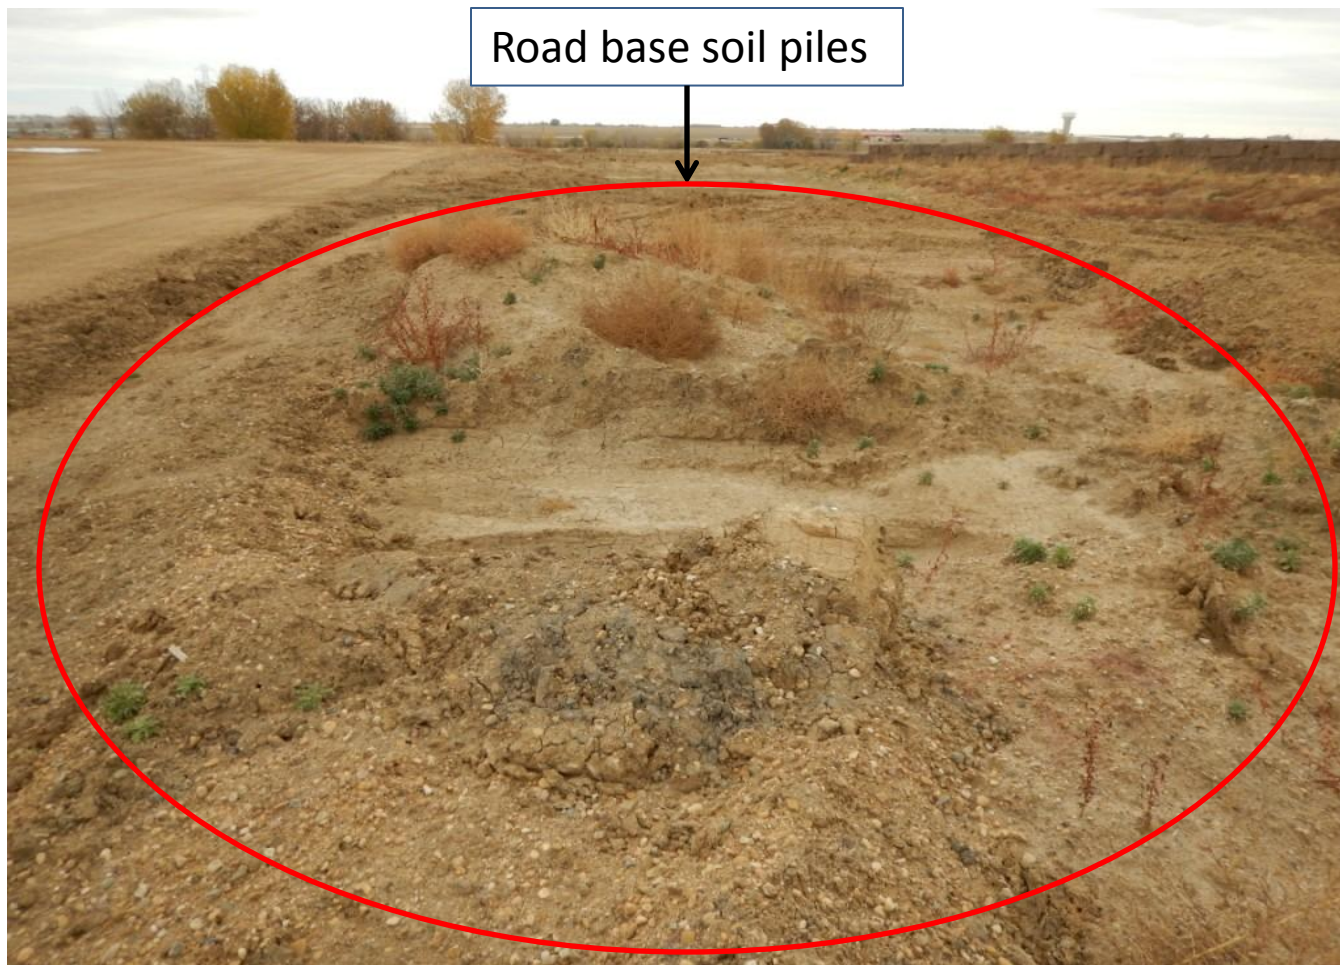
Photo taken from southeastern location, facing East. Need to remove road base soil piles and reclaim area.
